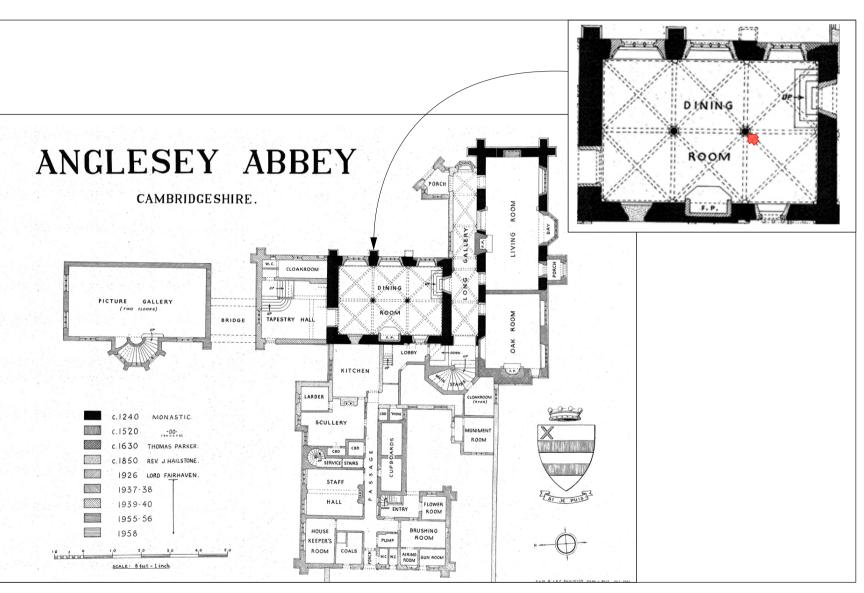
Ground floor plan of Anglesey Abbey showing location of excavation area (red)(reproduced with kind permission from the National Trust)
